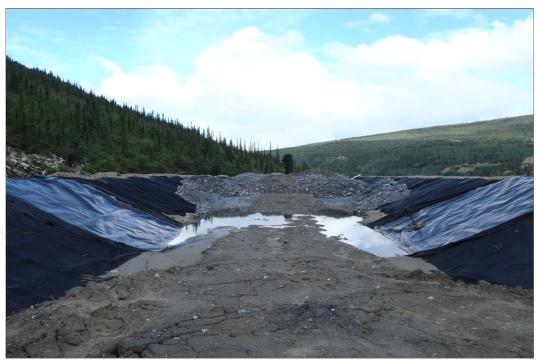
PAG Waste Storage Facility perimeter berm (Facing northwest – July 28, 2011)
